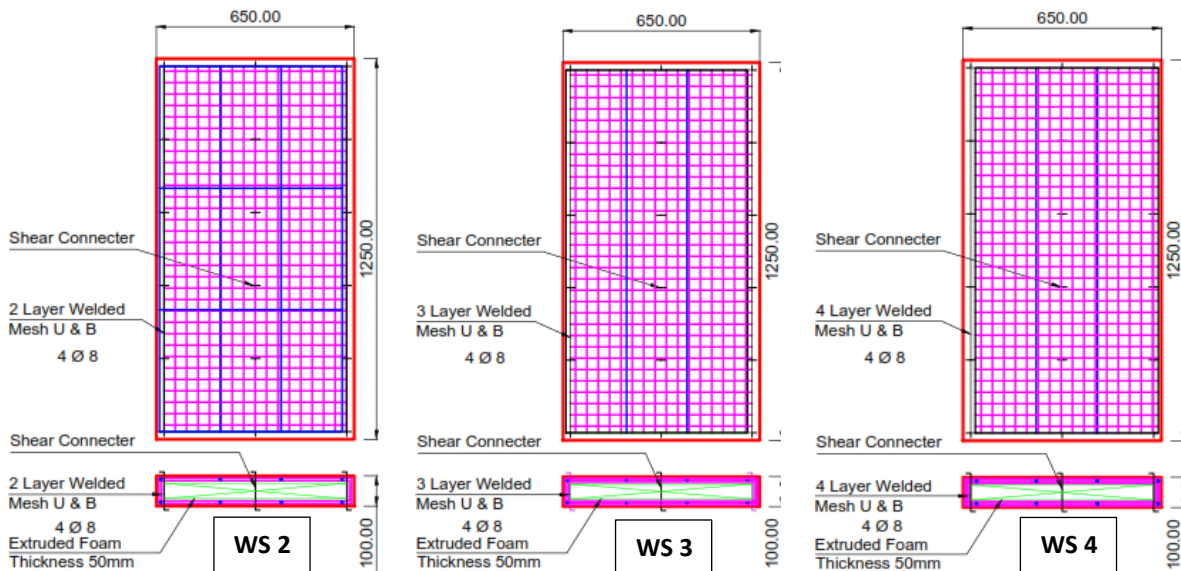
Reinforcement details of Group-2 walls (W2, W3 and W4).
